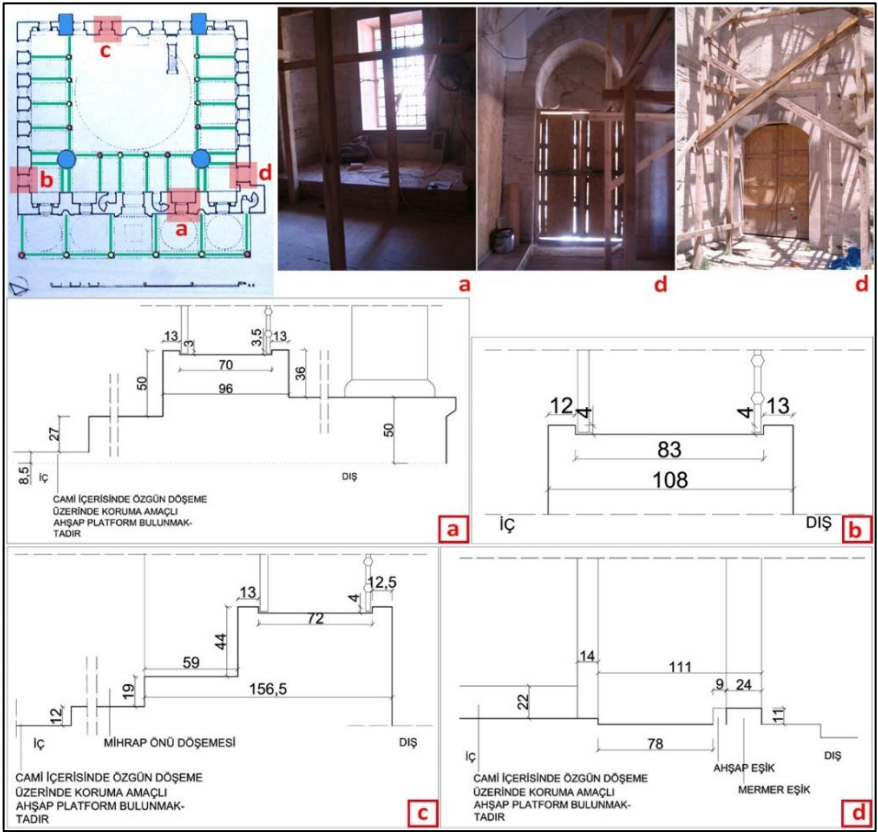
a-The thickness of the wall where the 1st-row windows of the mosque façade are located b-The wall thickness of the left side façade 1st-row row windows c-Mihrab facade (rear facade) wall thickness where the 1st-row windows are located d-The thickness of the wall on the right-side façade where the 2nd mosque door is located
